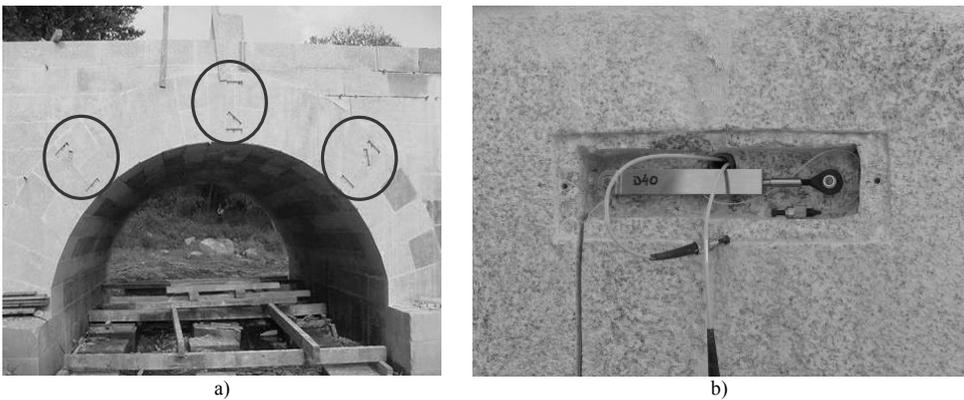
Displacement transducers in the joints: a) general layout for one arch and b) layout in a joint
